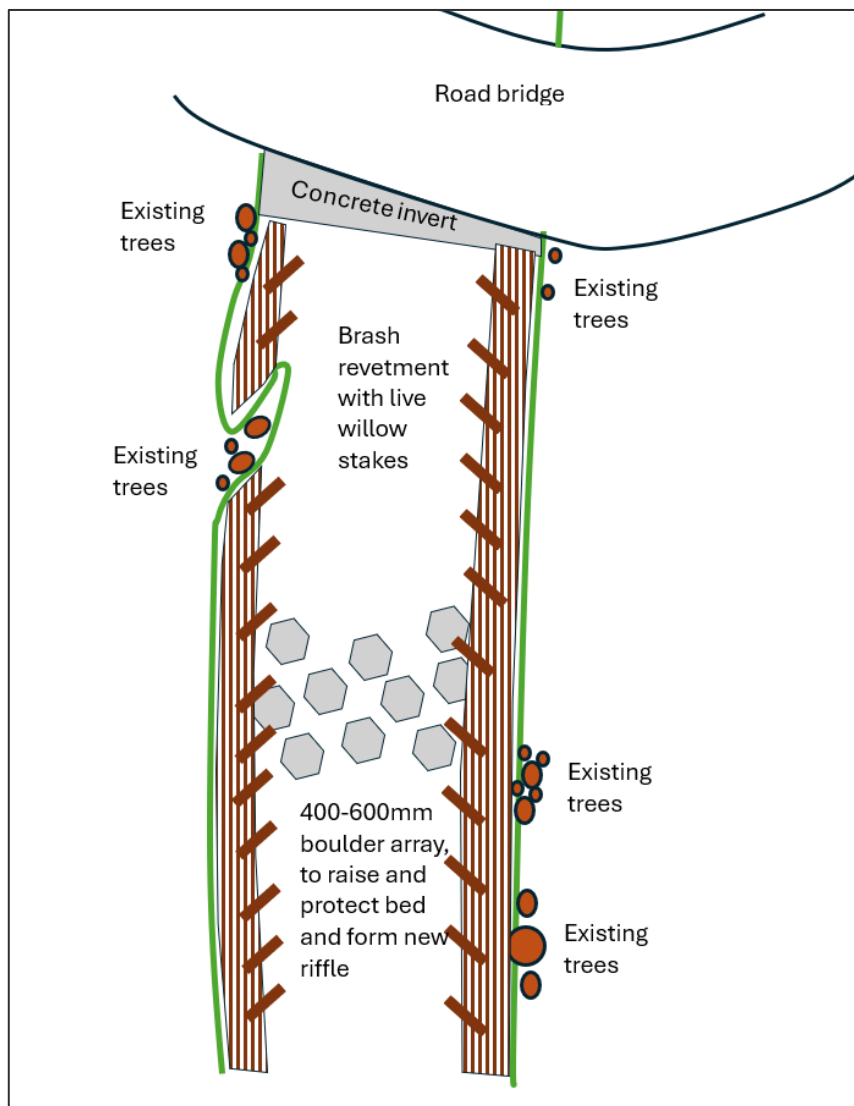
Showing detailed design drawing of the suggested restoration. Outlining the cross section, a loose arrangement of large boulders (400-600mm) in combination with brush/brushwood revetment.
